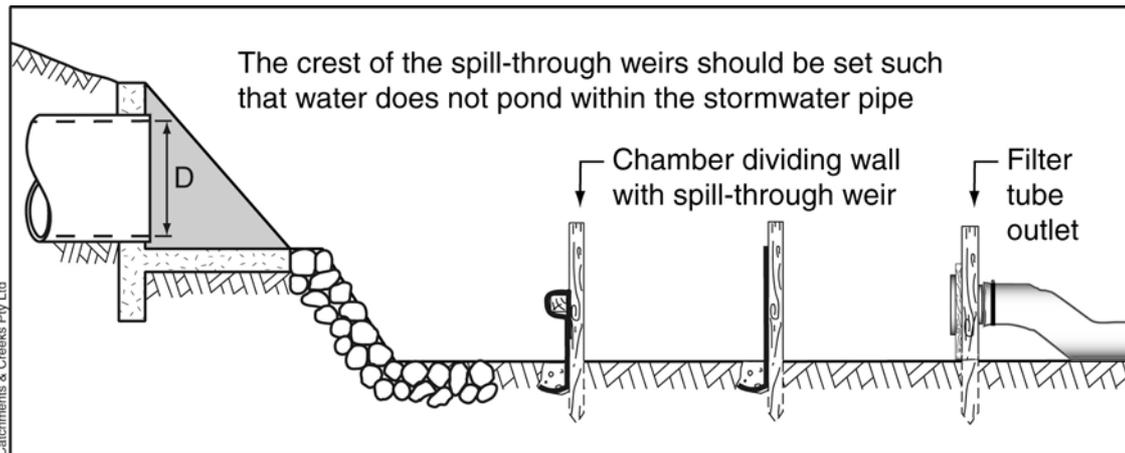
Coarse sediment trap placed downstream of an elevated stormwater outlet
